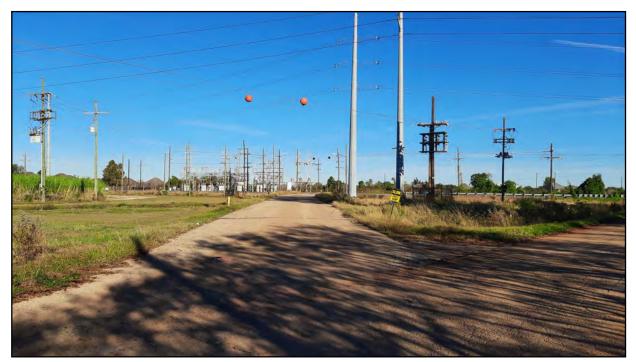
Overview photo of Access Road AR-11, facing south. Photo taken on November 19, 2023.
